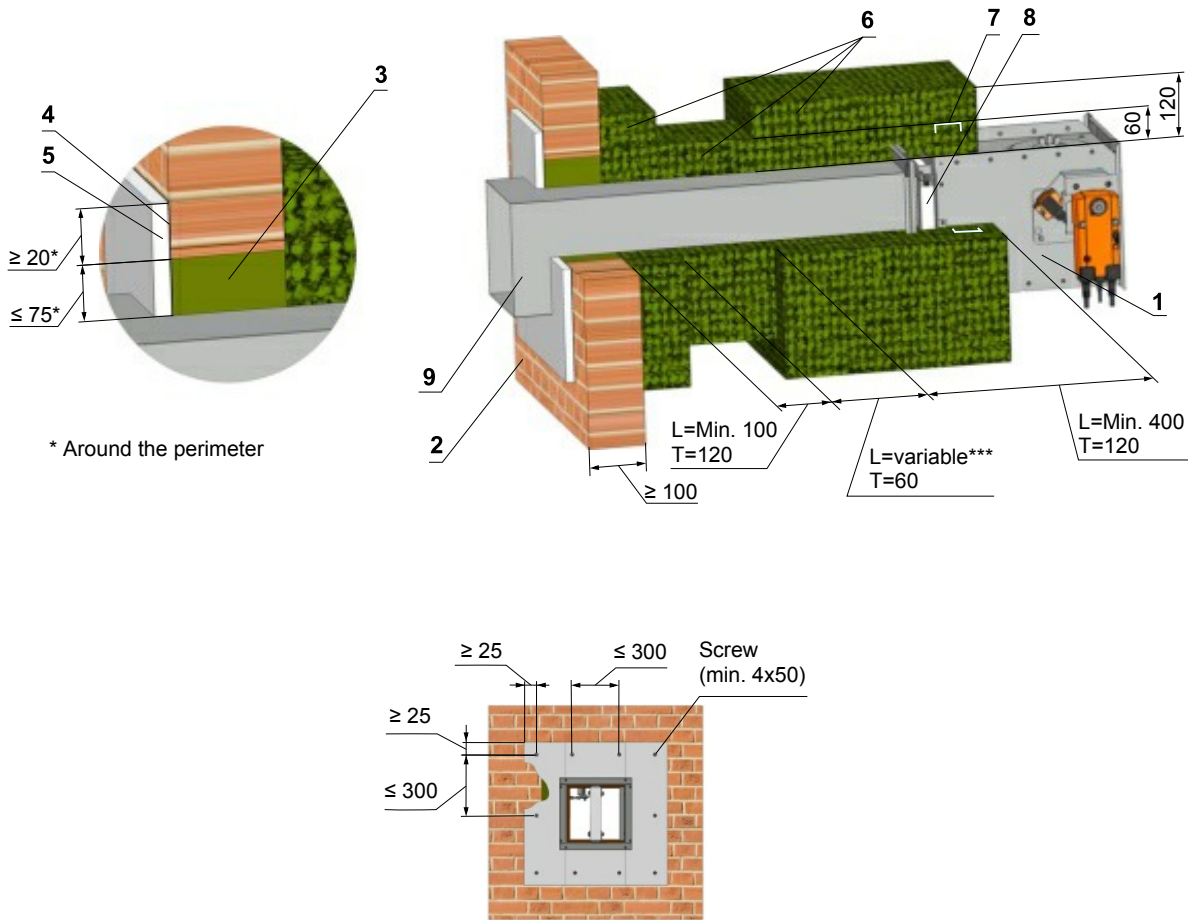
Outside solid wall construction - mineral wool, stuffing box, fire protection mastic and cement lime plate
